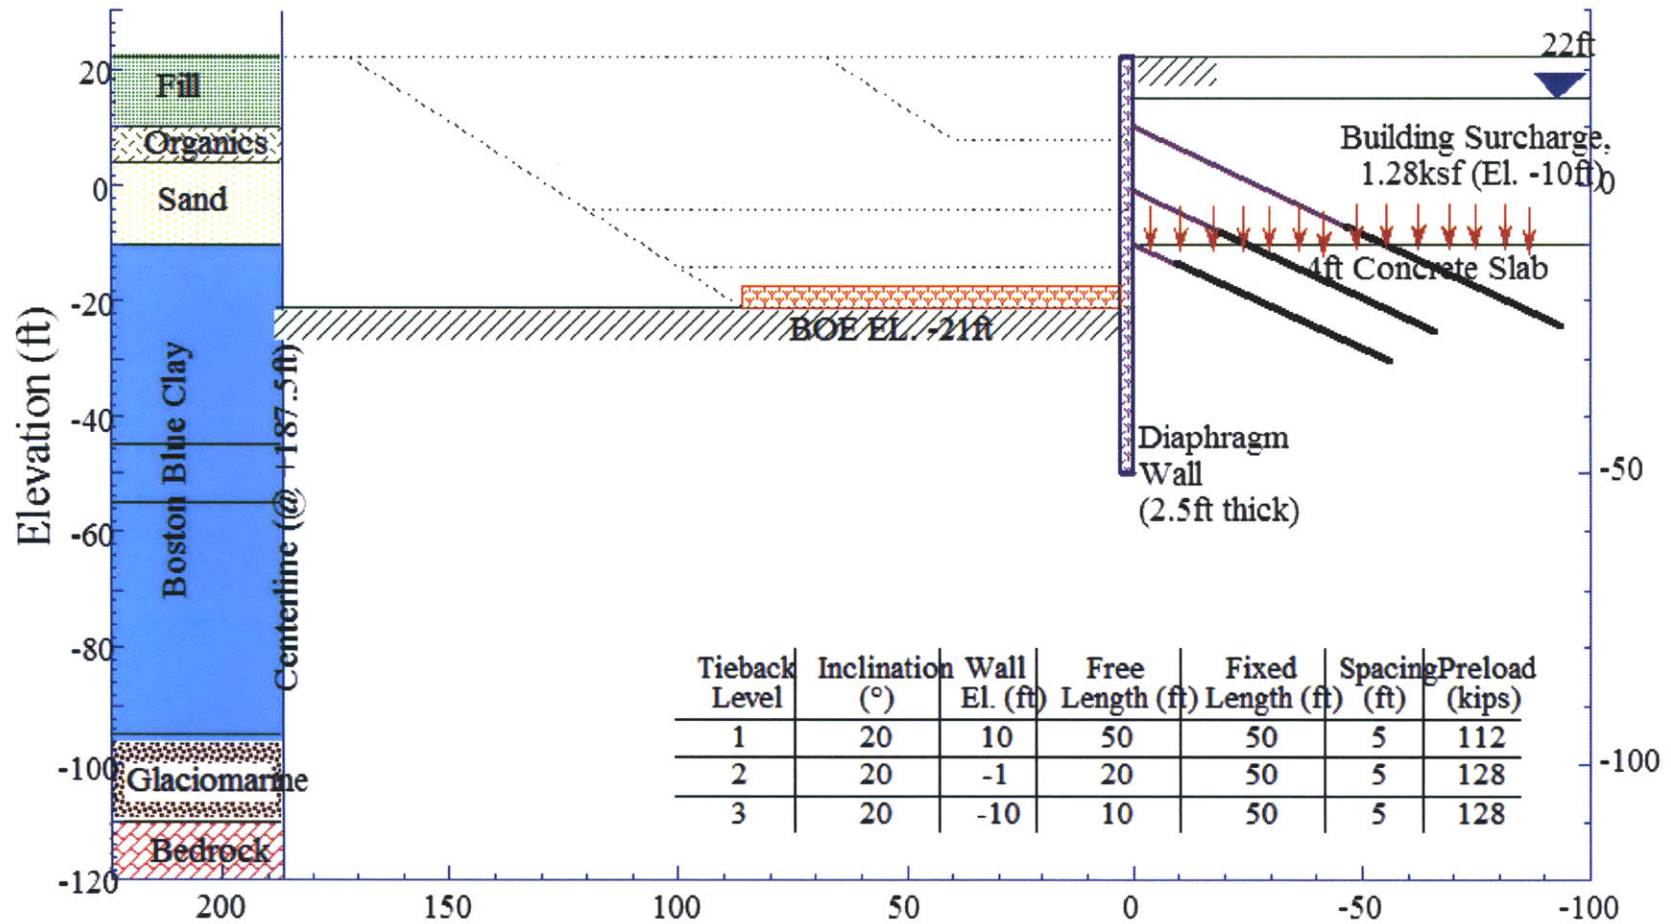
Typical Cross-Section of Tiebacks and Excavation (after Whittle, 2002)
